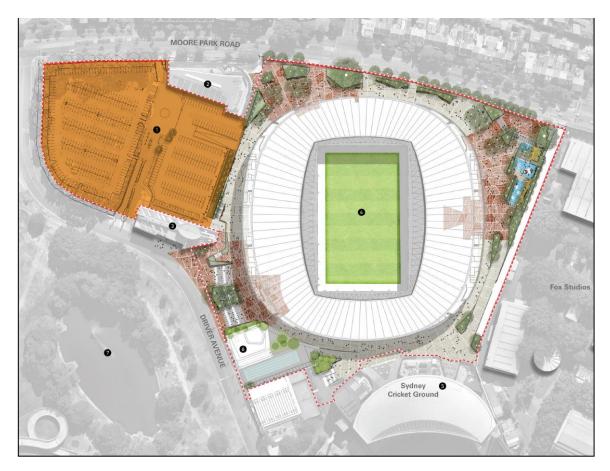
Precinct Village and Car Park Location (highlighted orange)
